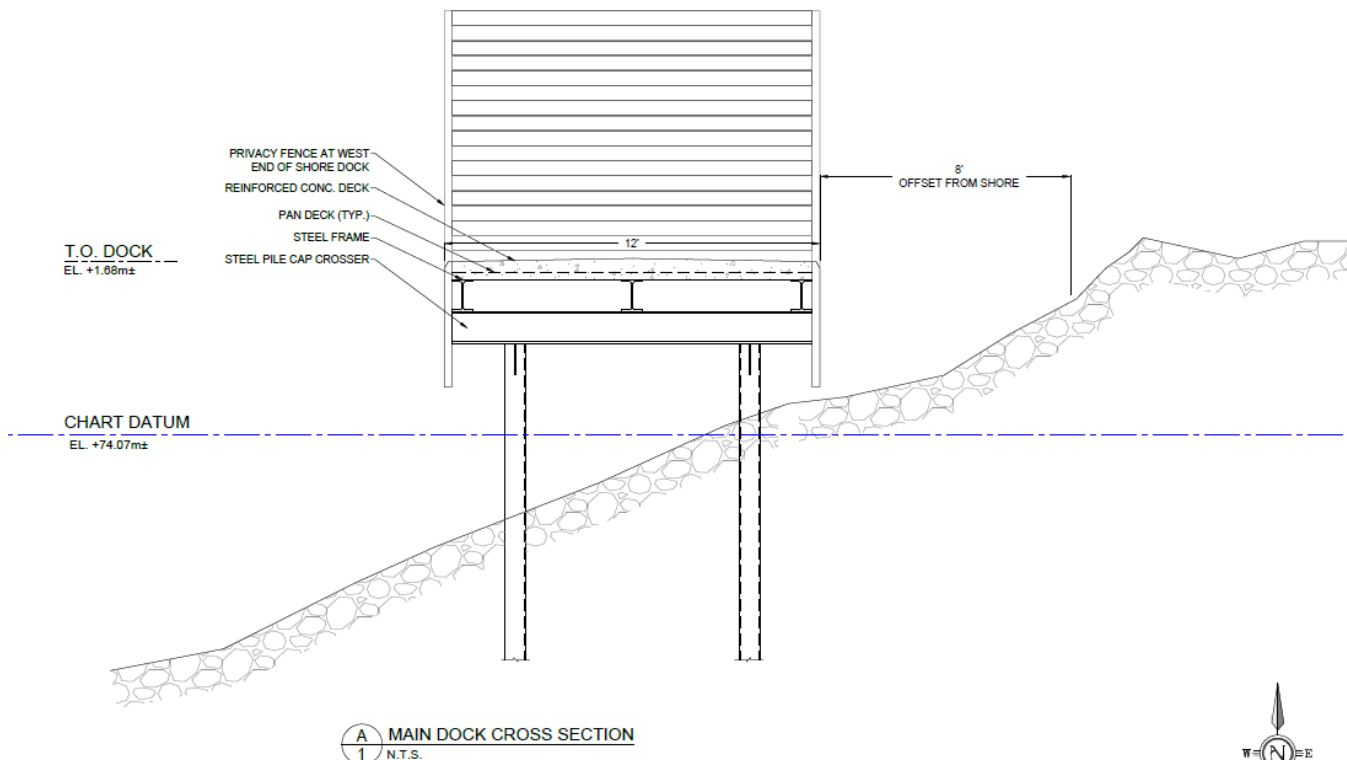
Dock Sectional Elevation (Source: Kehoe Marine Construction Ltd.)
